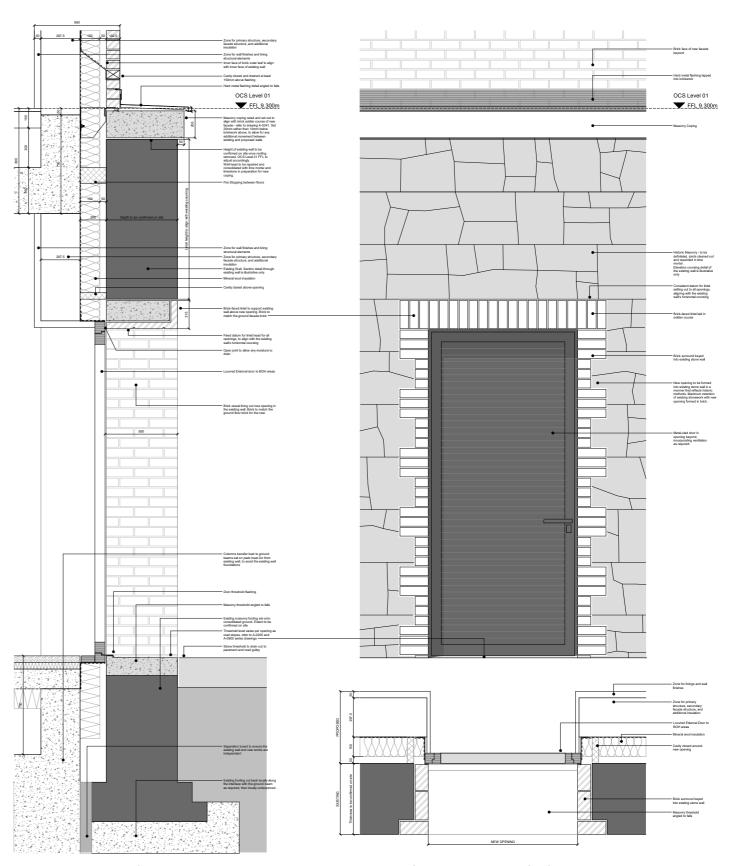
Detail of a typical door opening in the existing wall. Refer to A-300 series for further details
